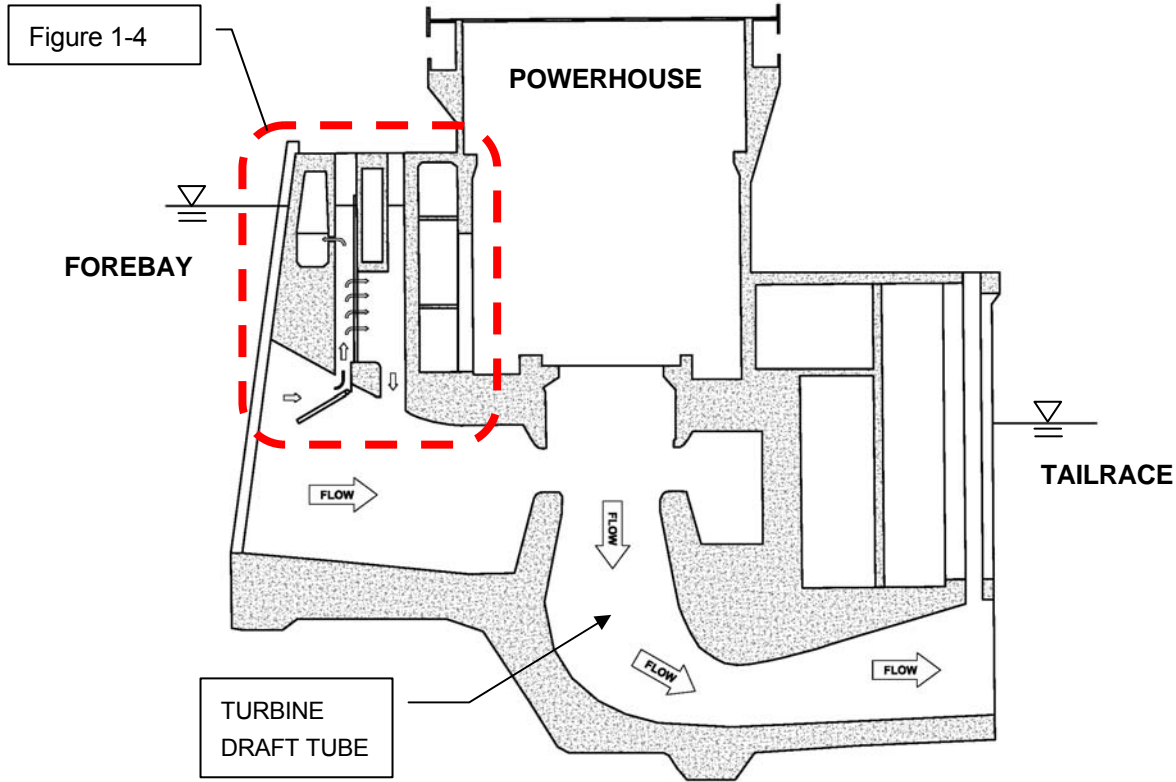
Cross section of Bonneville Dam Second Powerhouse
